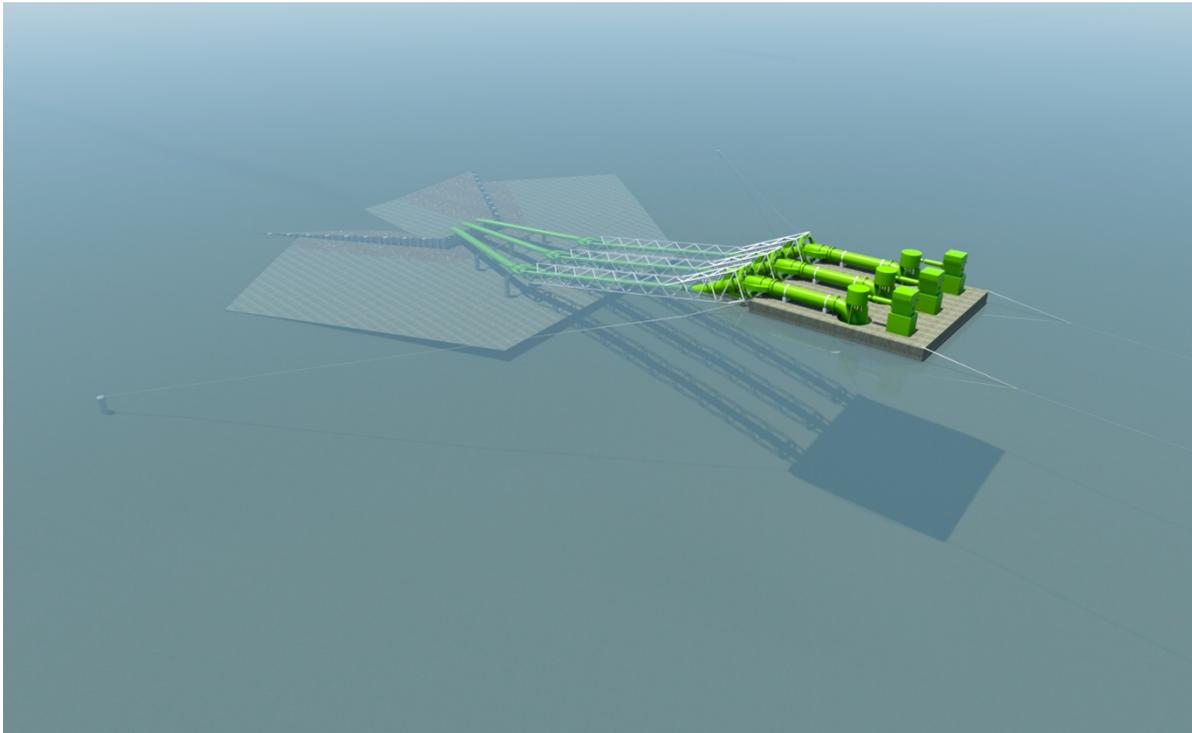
Alternative 4 – Floating Pumping Plant Conceptual Rendering – Maximum Pool
